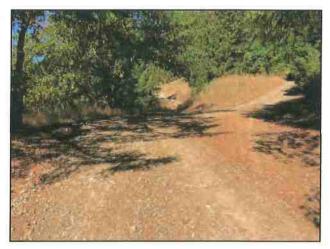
Privare Access Rd @ Curve w/ Turnout Looking NE
